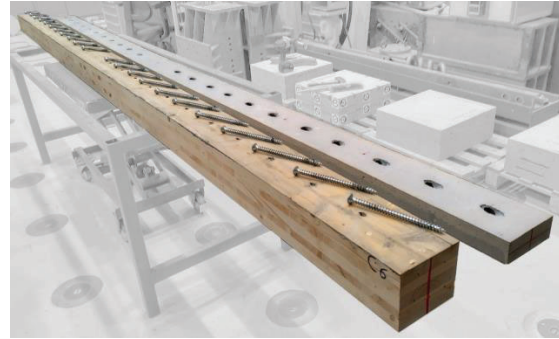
A CLT-concrete composite beam deconstructed after destructive bending test.
